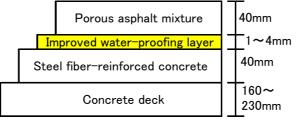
Pavement in the Concrete Deck Version (Reinforce Method)
